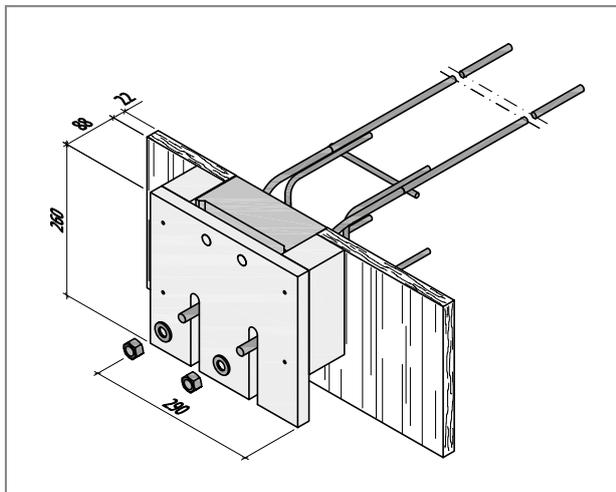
Schöck Isokorb® T type SQ: Representation with installation aid
